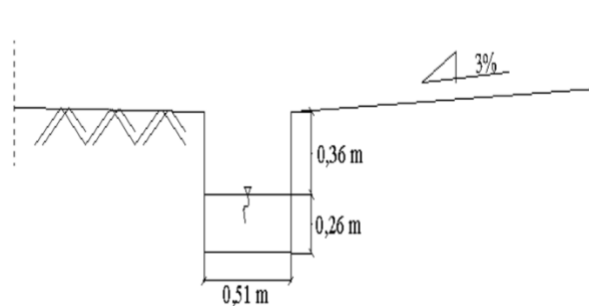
Cross-Sectional and Longitudinal Profiles of the Catchment and Drainage Area
